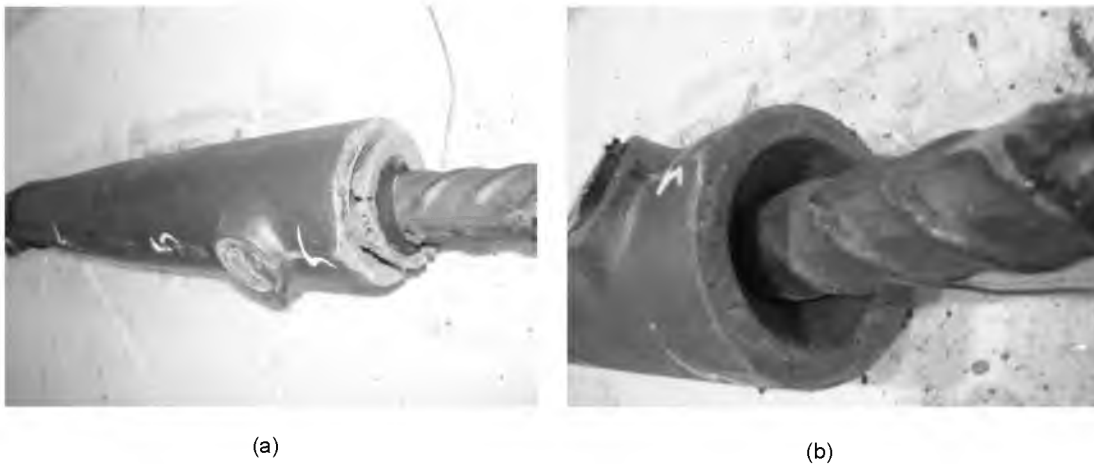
NMB Splice Sleeve Grout Breakout: (a) with Grout Cone (b) with Grout Cone Removed
